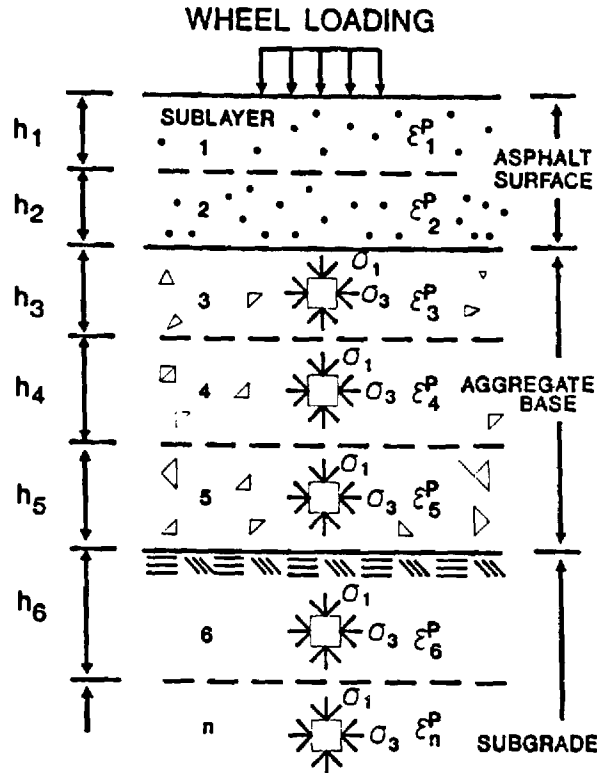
Idealization of Layered Pavement Structure for Calculating Rut Depth (After Barksdale, Ref. C-9).
